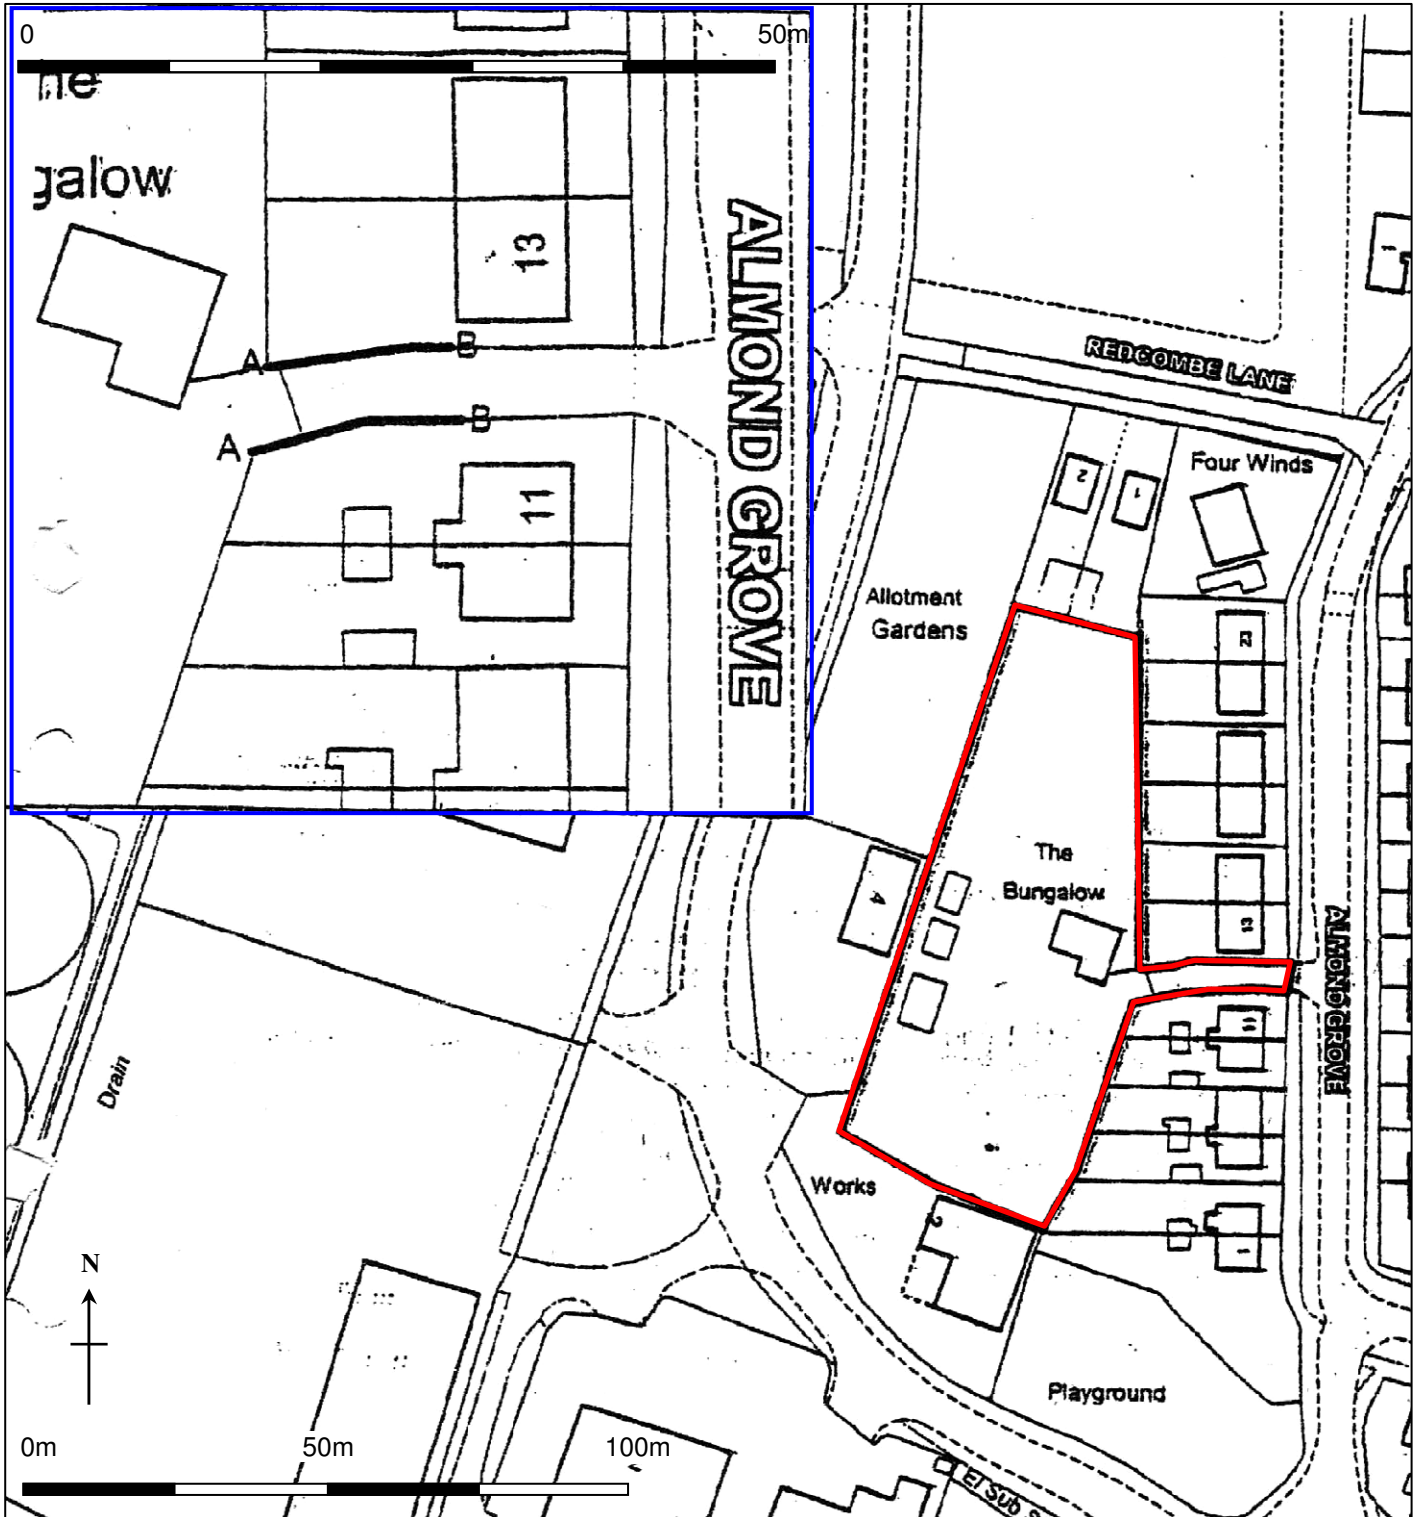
Location plan of the site (outlined in red) at scale 1:1250, with an inset detail (blue) at scale 1:500. The buildings depicted on the site have now been demolished. Plan supplied by client.
